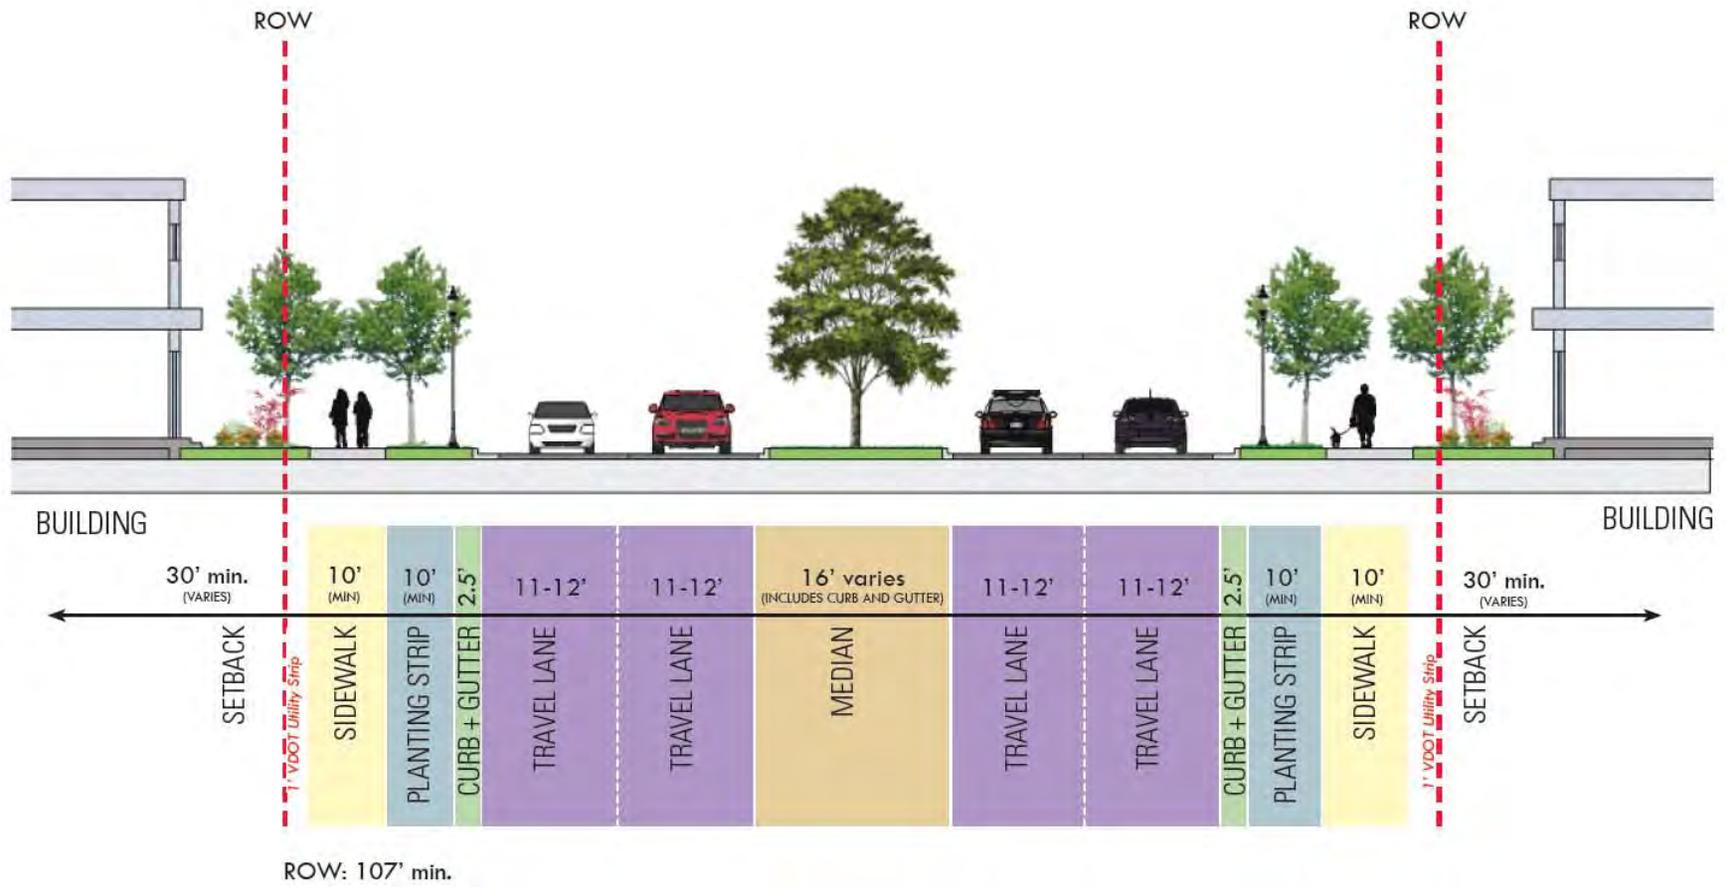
Conceptual Cross Section: Local Mixed Use Boulevard (e.g. Station Drive)
